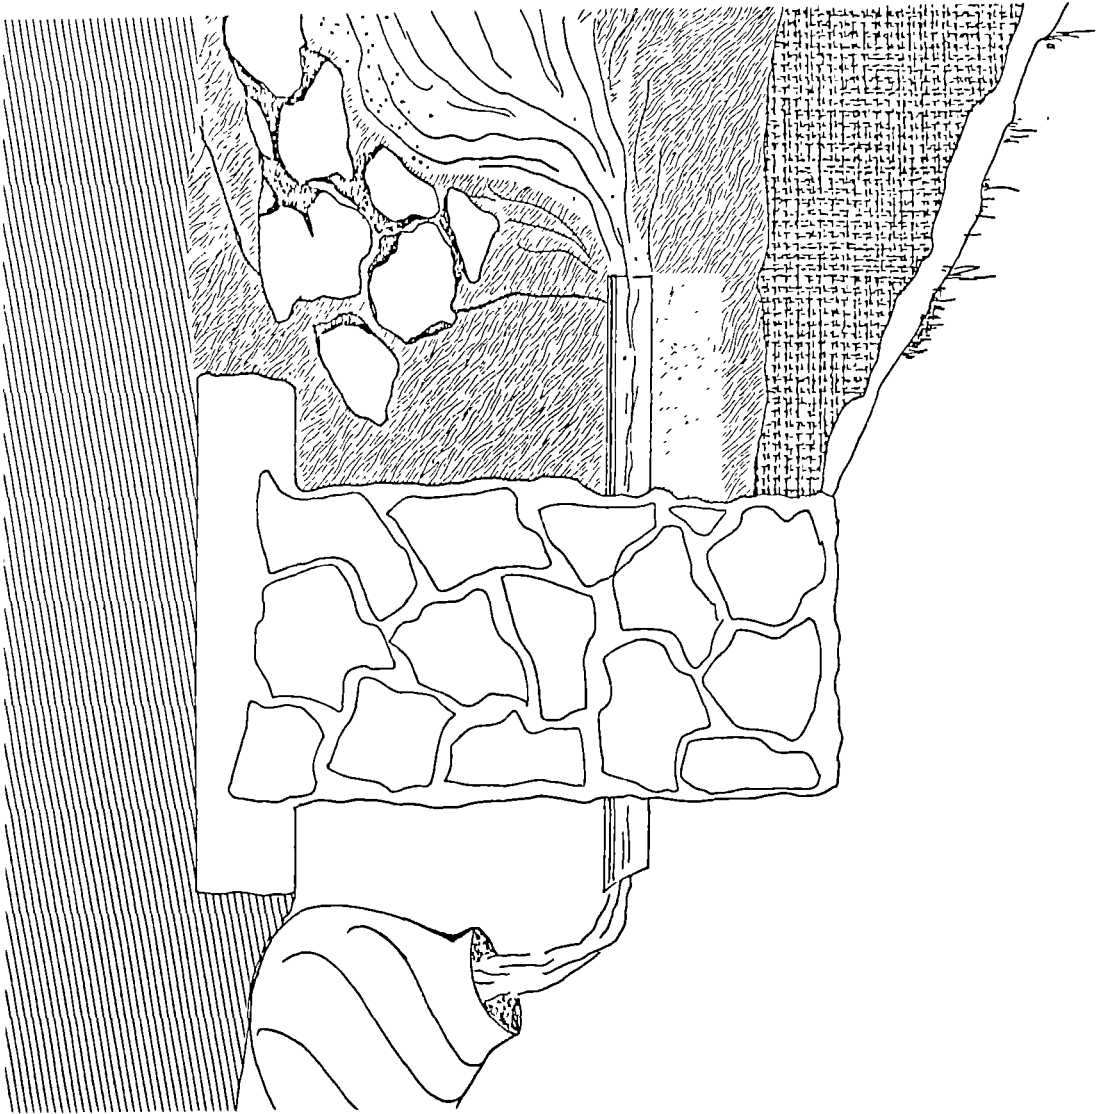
Figure F. Nearly Completed Retaining Wall, Showing Rock and Gravel Fill-in
